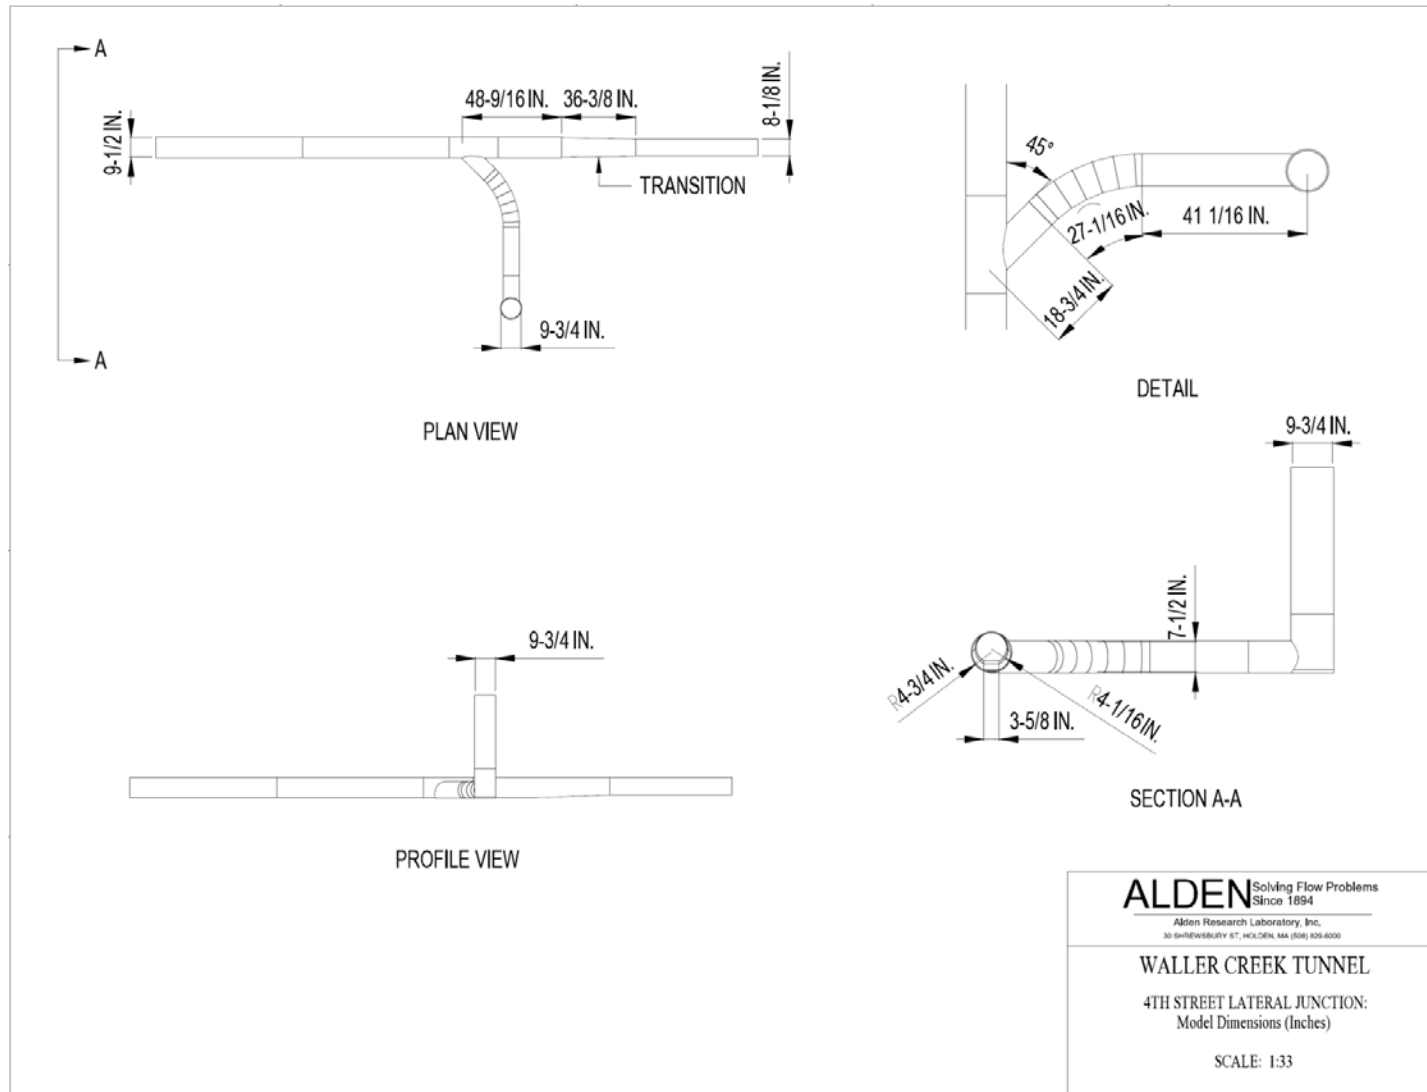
Waller Creek Tunnel Project; 1:33 Scale Model 4th Street Lateral Dimensions
